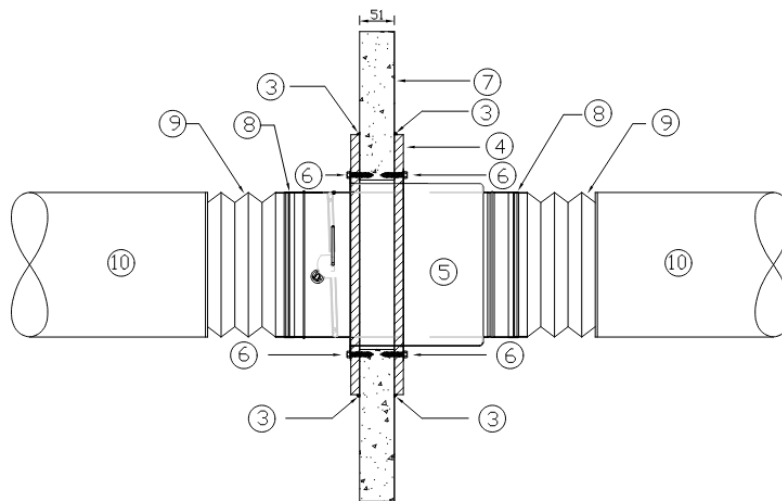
Section view of BSD-PW-KOROK (51 mm thick) damper
